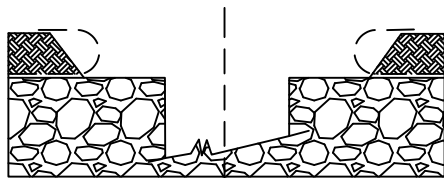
TRENCH EXCAVATION WITH CORNERS
